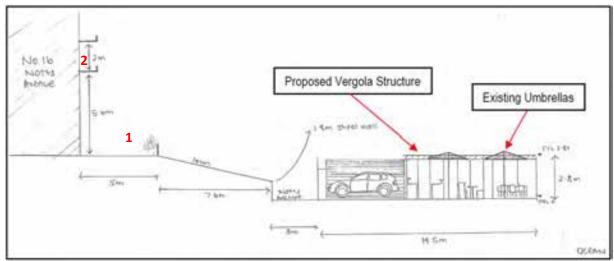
Section diagram detailing the location of the photographs taken at 1 and 2.
